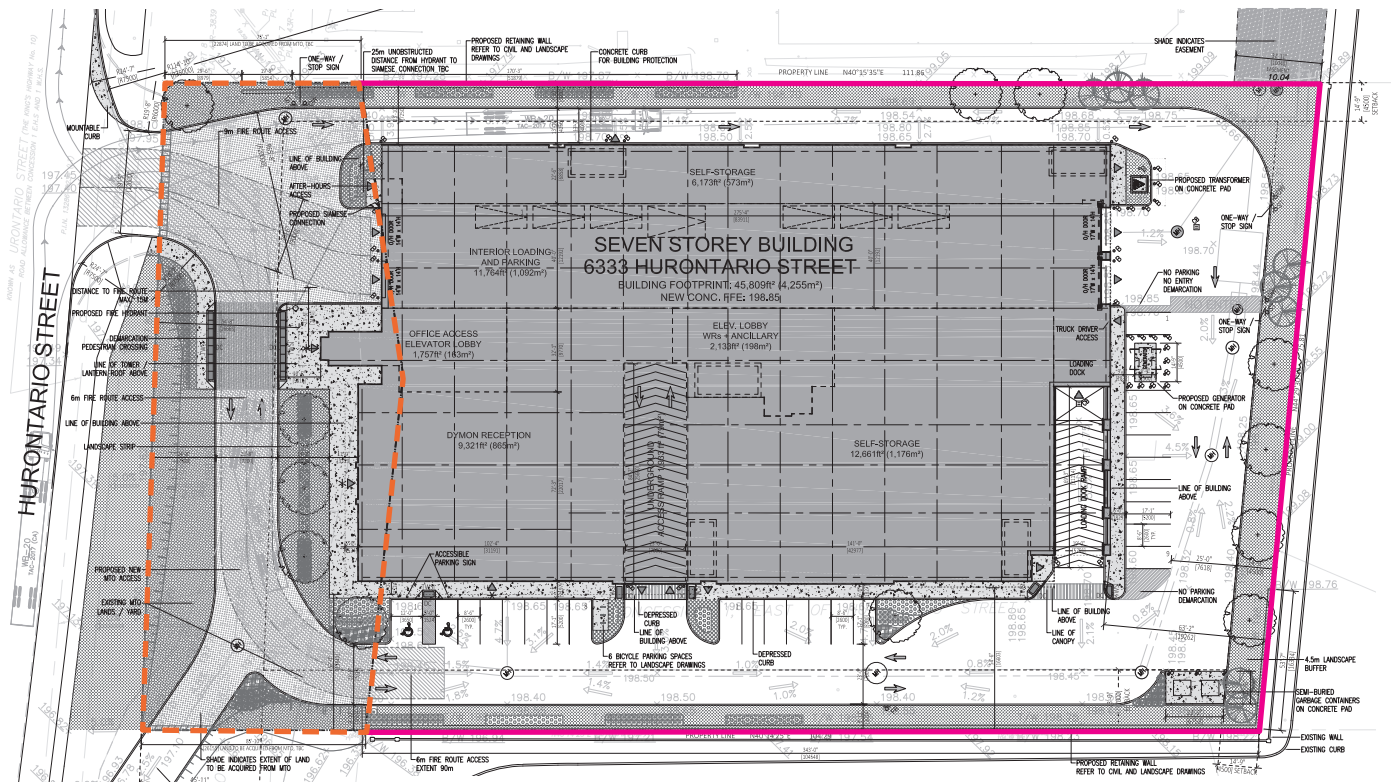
Site Plan by Nicholas Caragianis Architect Inc.
